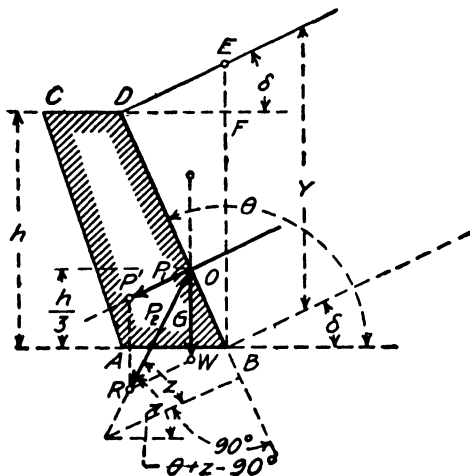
PRESSURE ON AN INCLINED RETAINING WALL.
